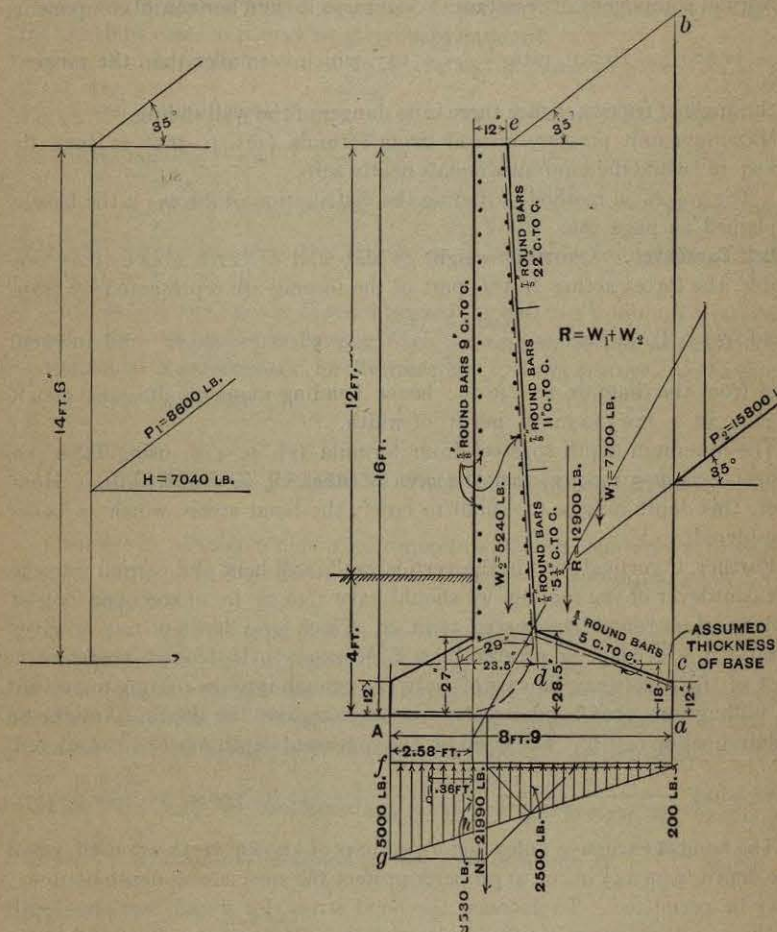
Design of T-shaped Retaining Wall. (See p. 669.)
